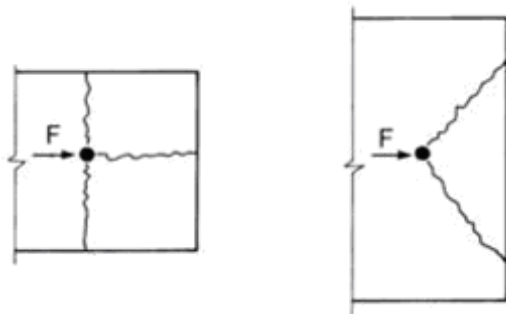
Possible splitting modes for a dowel close to a free concrete edge, from Betongelementföreningen (2000).
